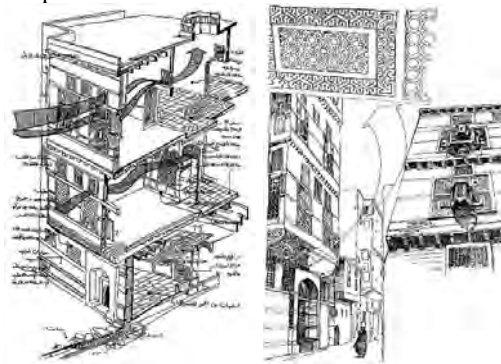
Cross section and Elevation diagrams of Kandel house in Rosetta [1].
